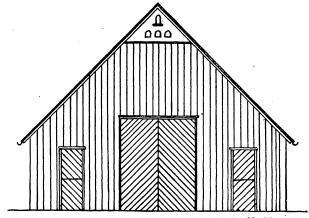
Front elevation of \$450 barn. (Design No. 1.)
